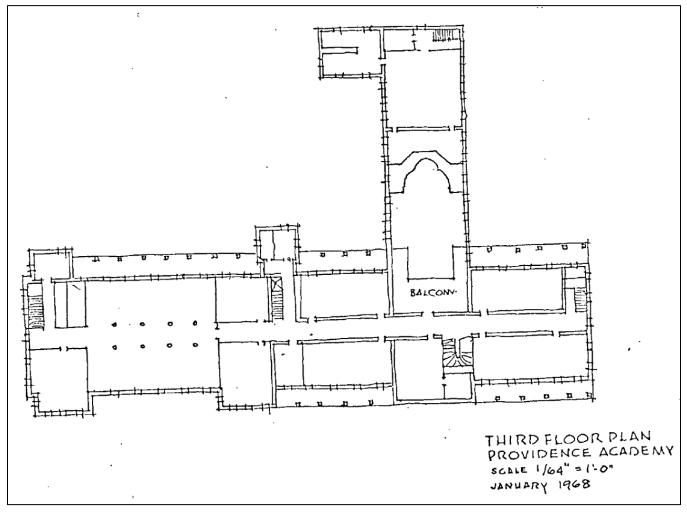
<u>House of Providence third floor plan in 1968 (Lentz, "House of Providence, Vancouver, Washington," Supplemental materials).</u>
